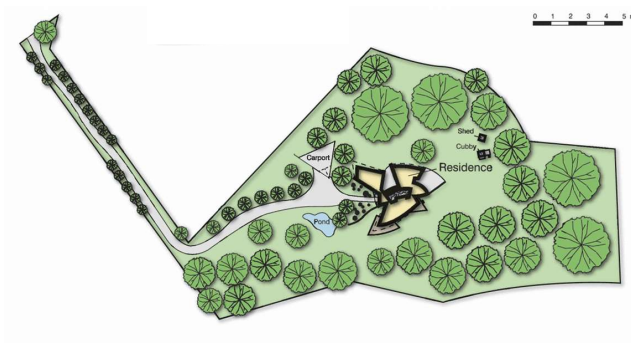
Site plan. (Source: Realestate.com.au 2016)
